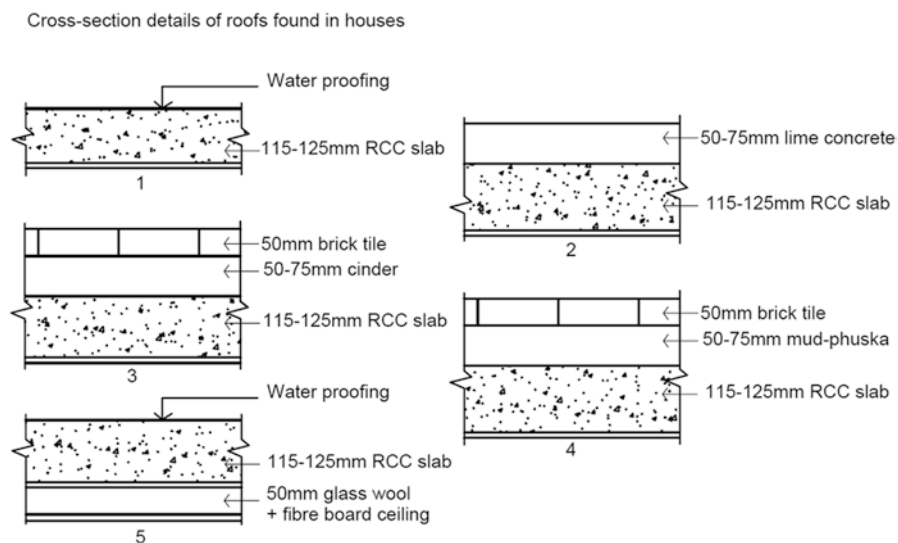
Details of flat roofs found in houses at Hamirpur (HP)
